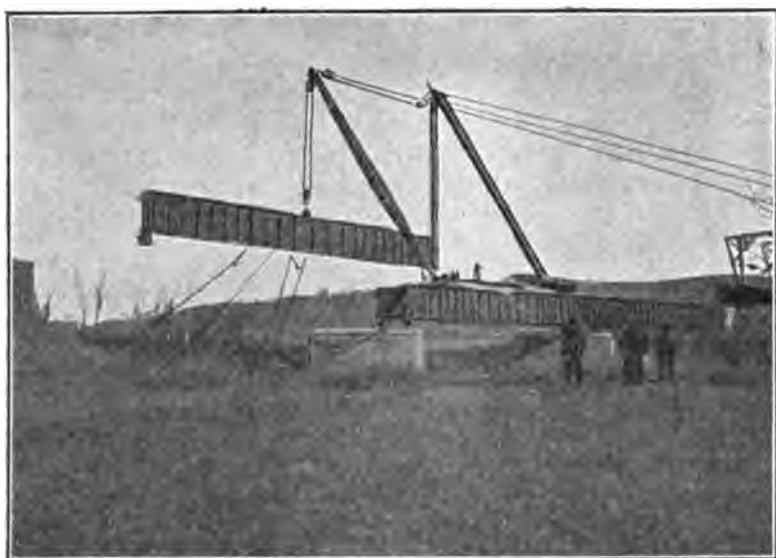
Derrick Erecting 85-foot Plate Girder on Western Maryland R.R.
